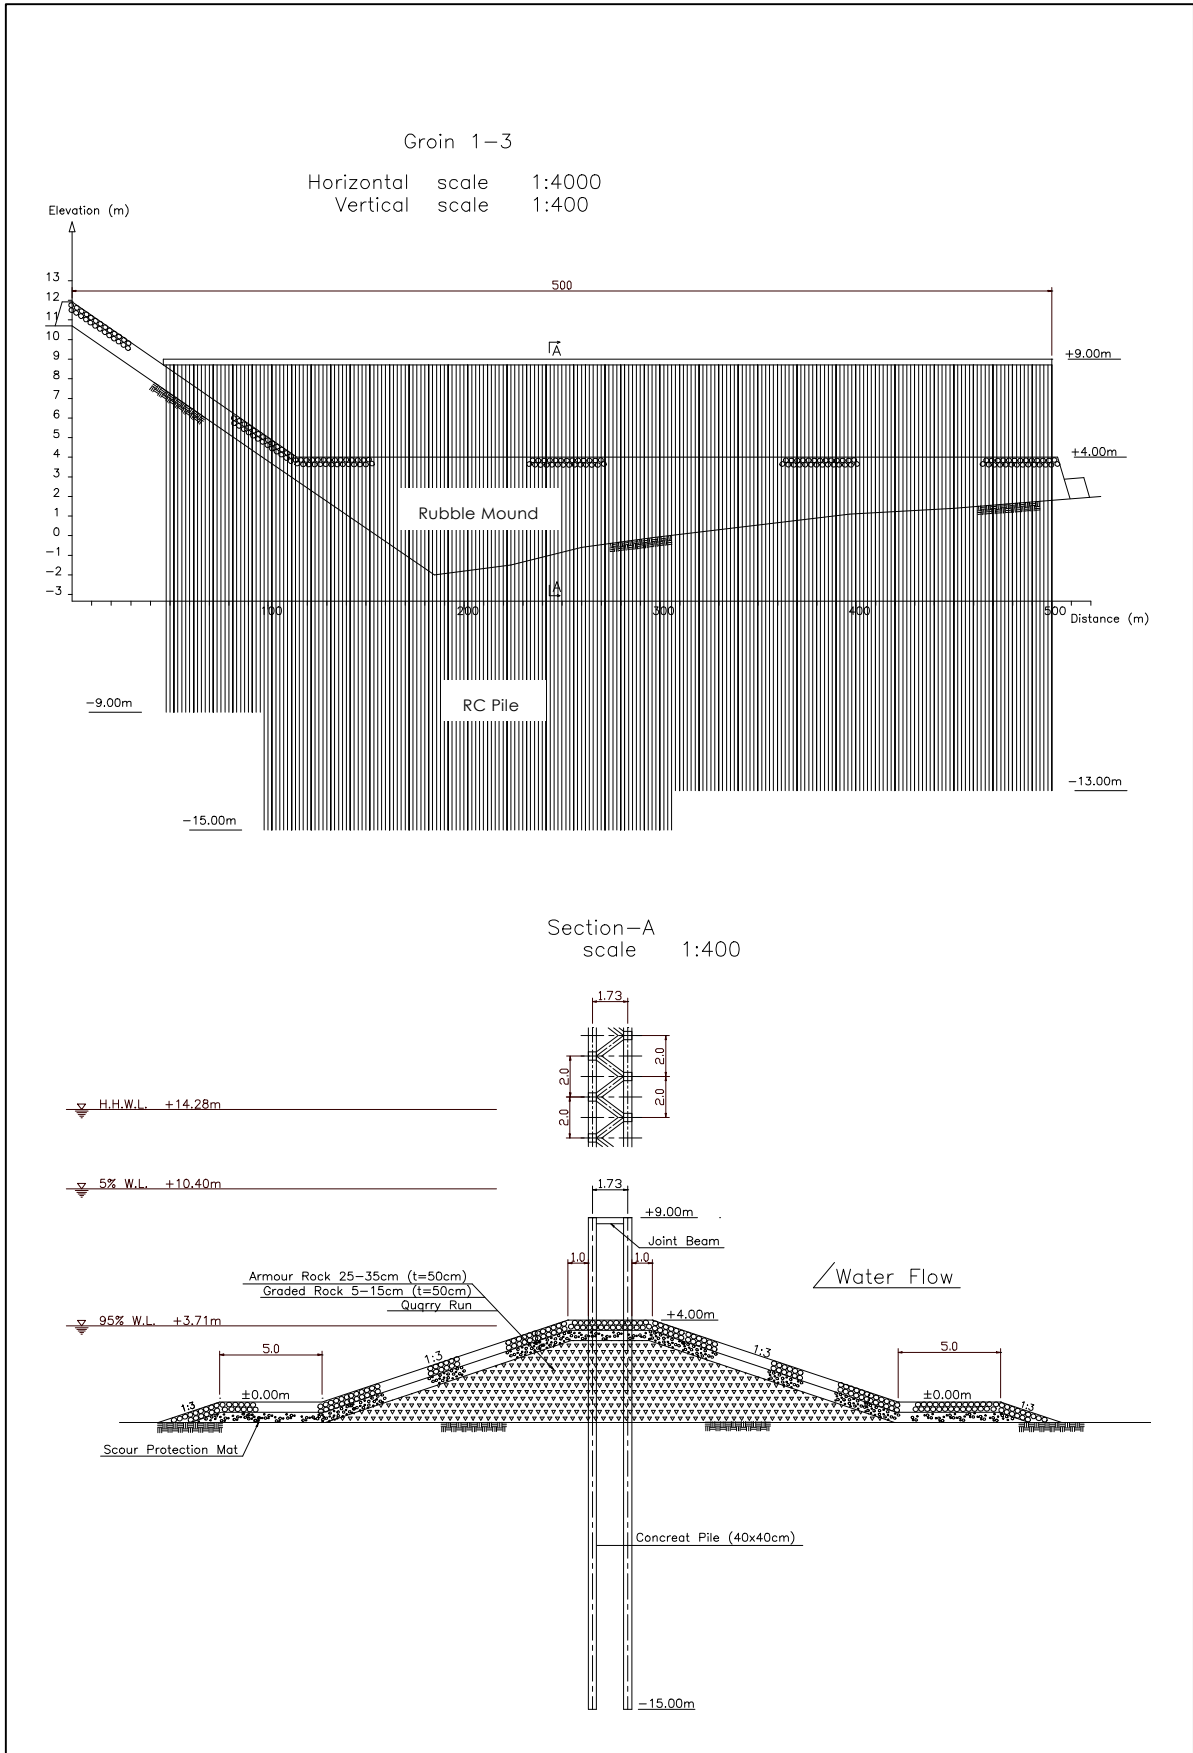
Typical Profiles of Groins (Groin-1)
